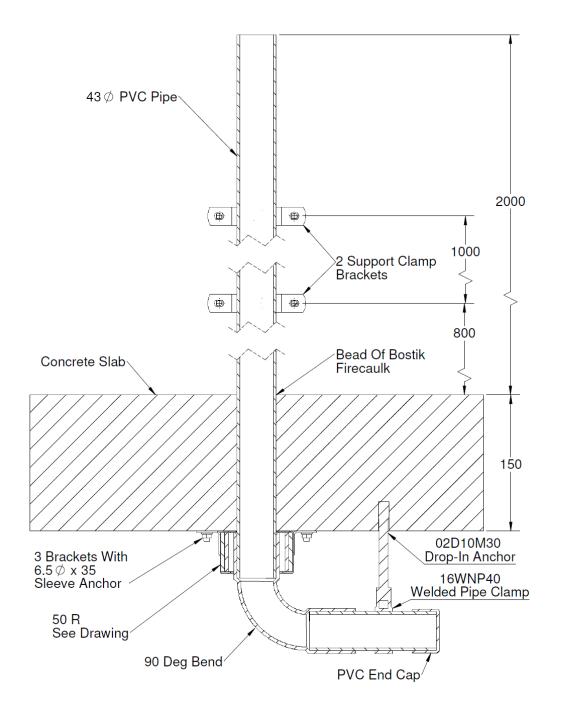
Specimen 10. 40 mm Ø PVCU Pipe Stack with 90° Elbow in 50R Retro-fit Collar
